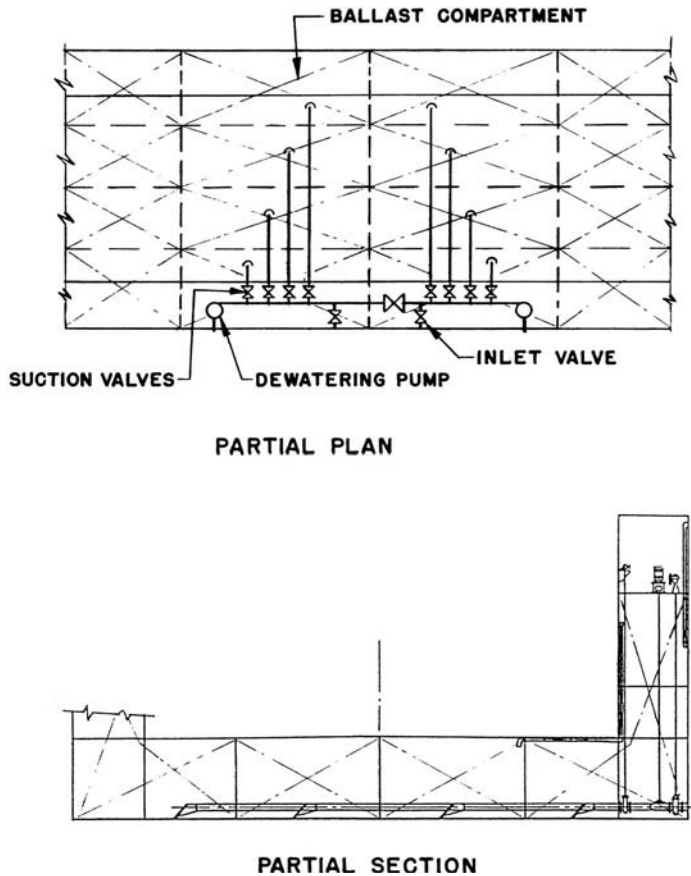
Pump and valve arrangement for valve-controlled dock
